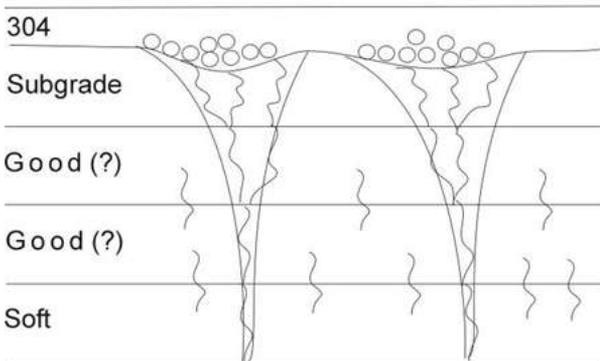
F - Stage 3 Hauling, Grading, and Placing 304
